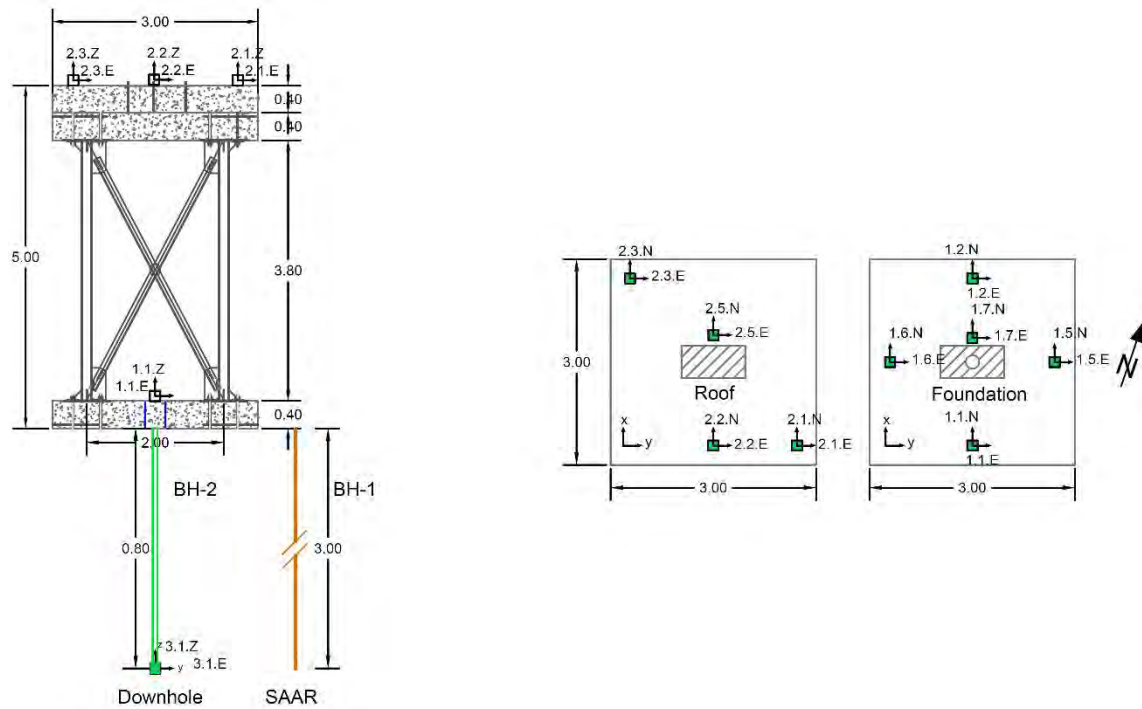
A cross-section and a plan view of the instrumentation layout of EUROPROTEAS structure
